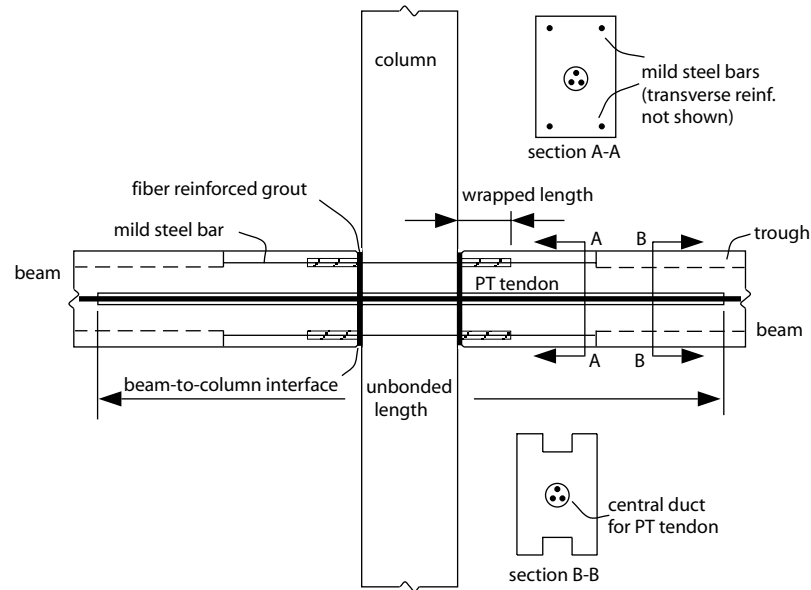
Partially post-tensioned precast beam-column subassemblages (adapted from Kurama 2002)
